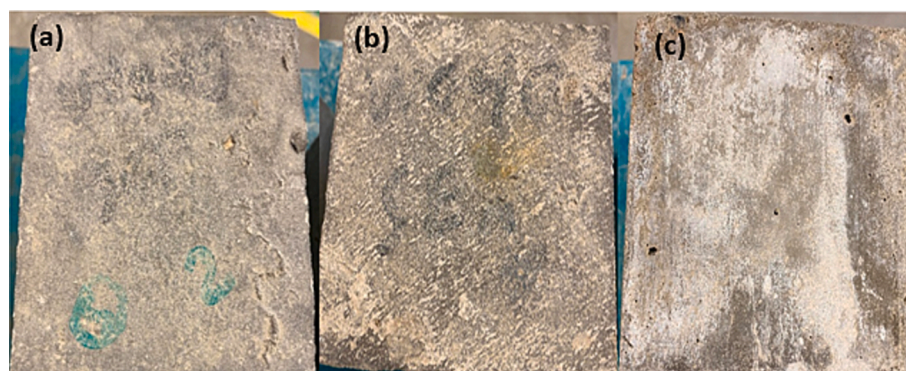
Some of the test specimens after 20 weeks of exposure to sulphate, (a) NAC1 specimen, (b) SCP + SE specimen, (c) RAC2 specimen.
